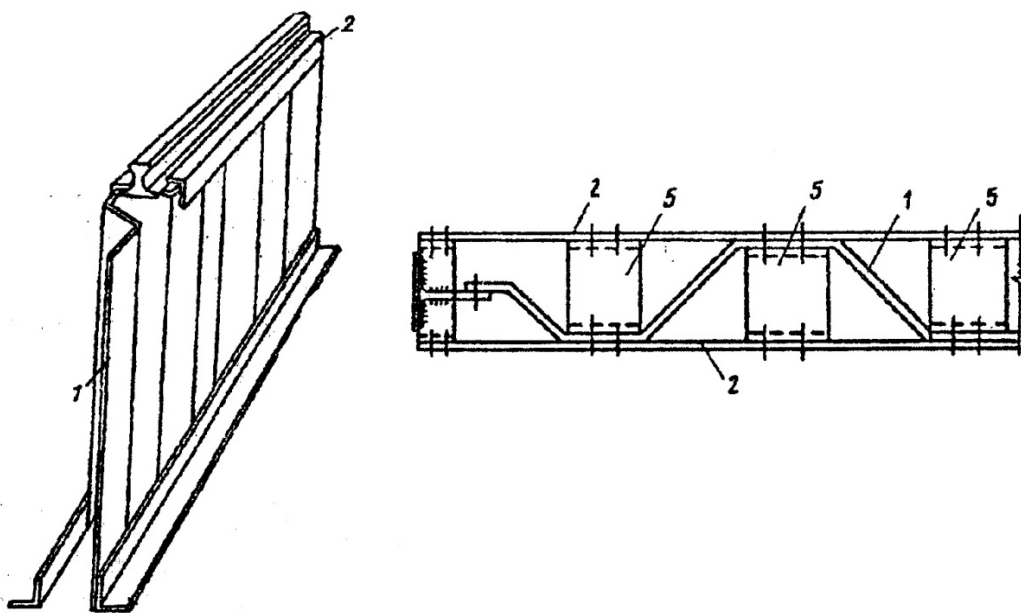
The scheme of assembly beam with a given excess droppers and wall above corners of the upper waist belt: 1 – wall beam; 2 – corners of the upper waist belt; 3 – droppers
